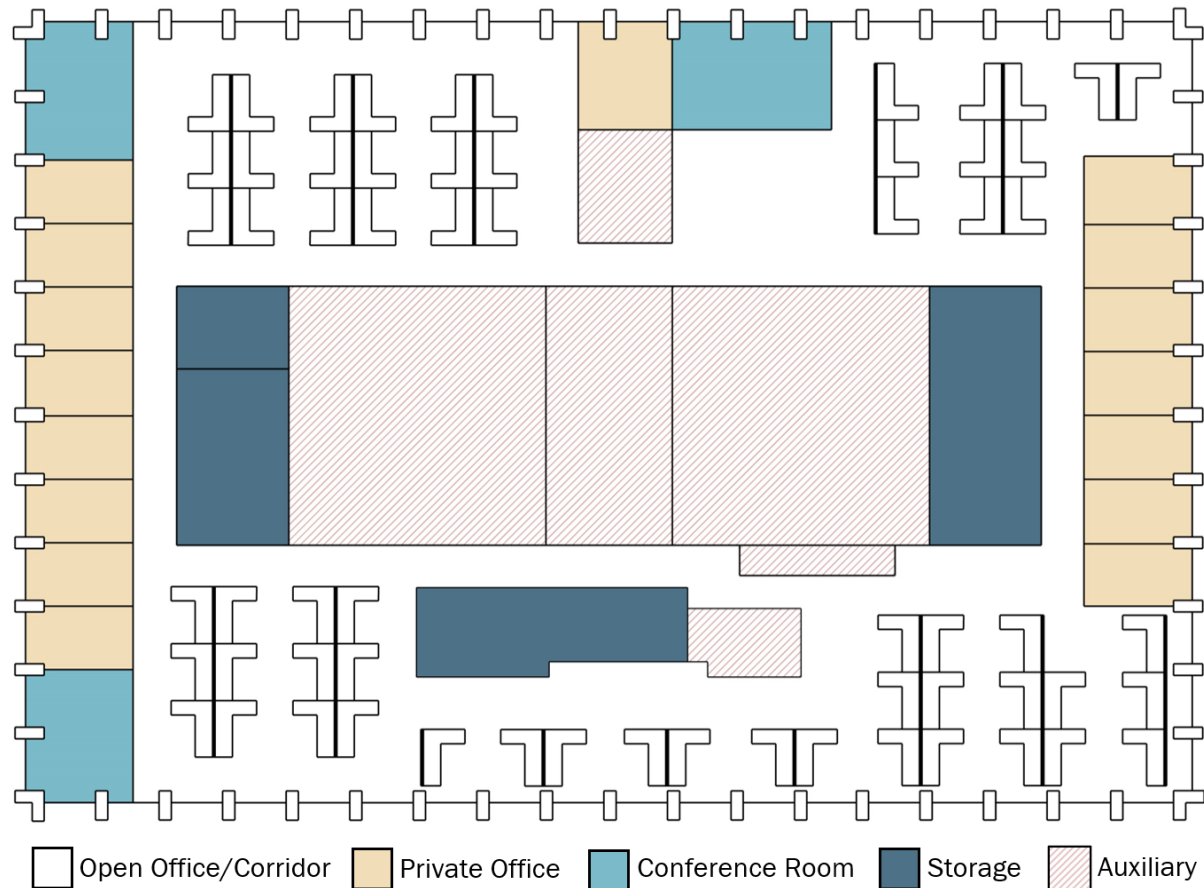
Schematic floorplan of the 23rd floor including existing furniture layout and space type distribution.
